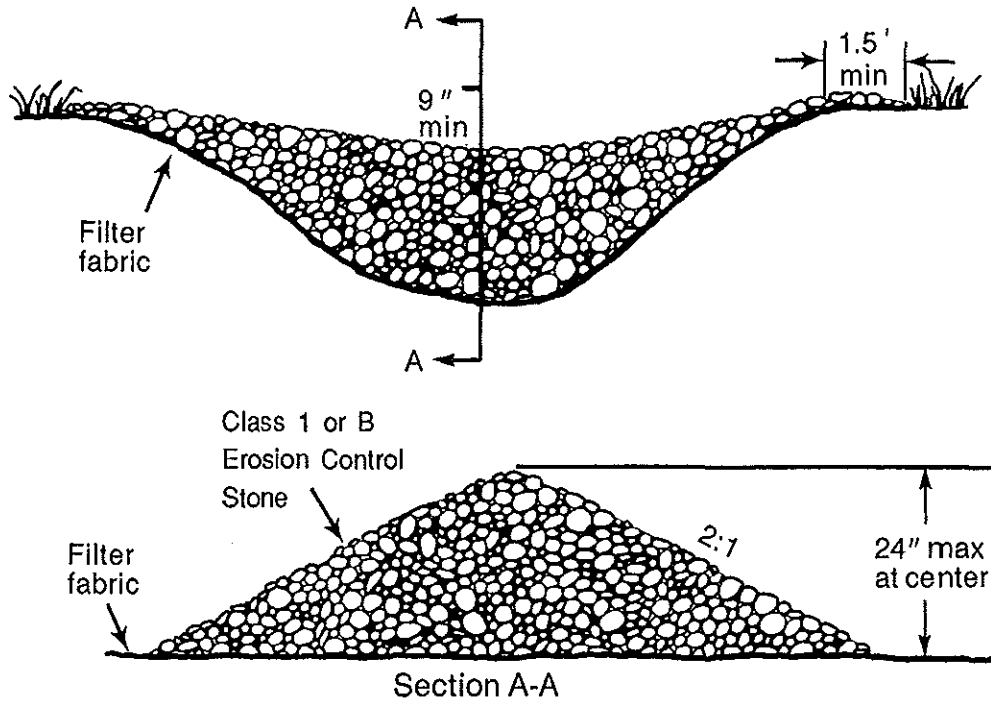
Stone check dam—Stone should be placed over the channel banks to keep water from cutting around the dam.
